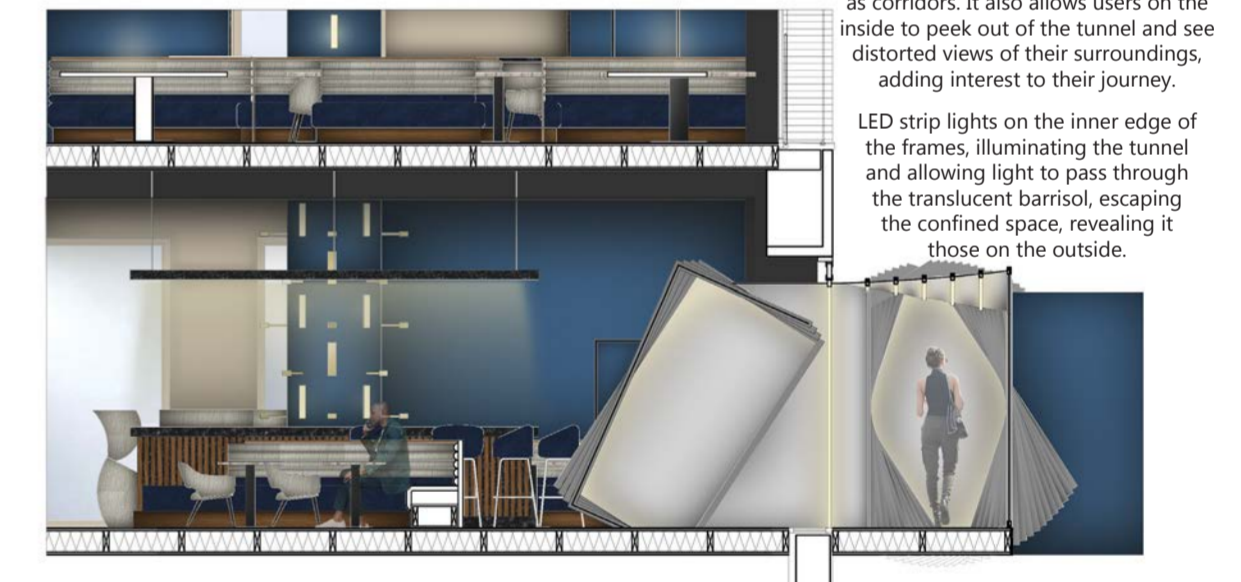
DETAIL CROSS SECTION CC - BAR AND TUNNEL DESIGN SCALE 1:50
